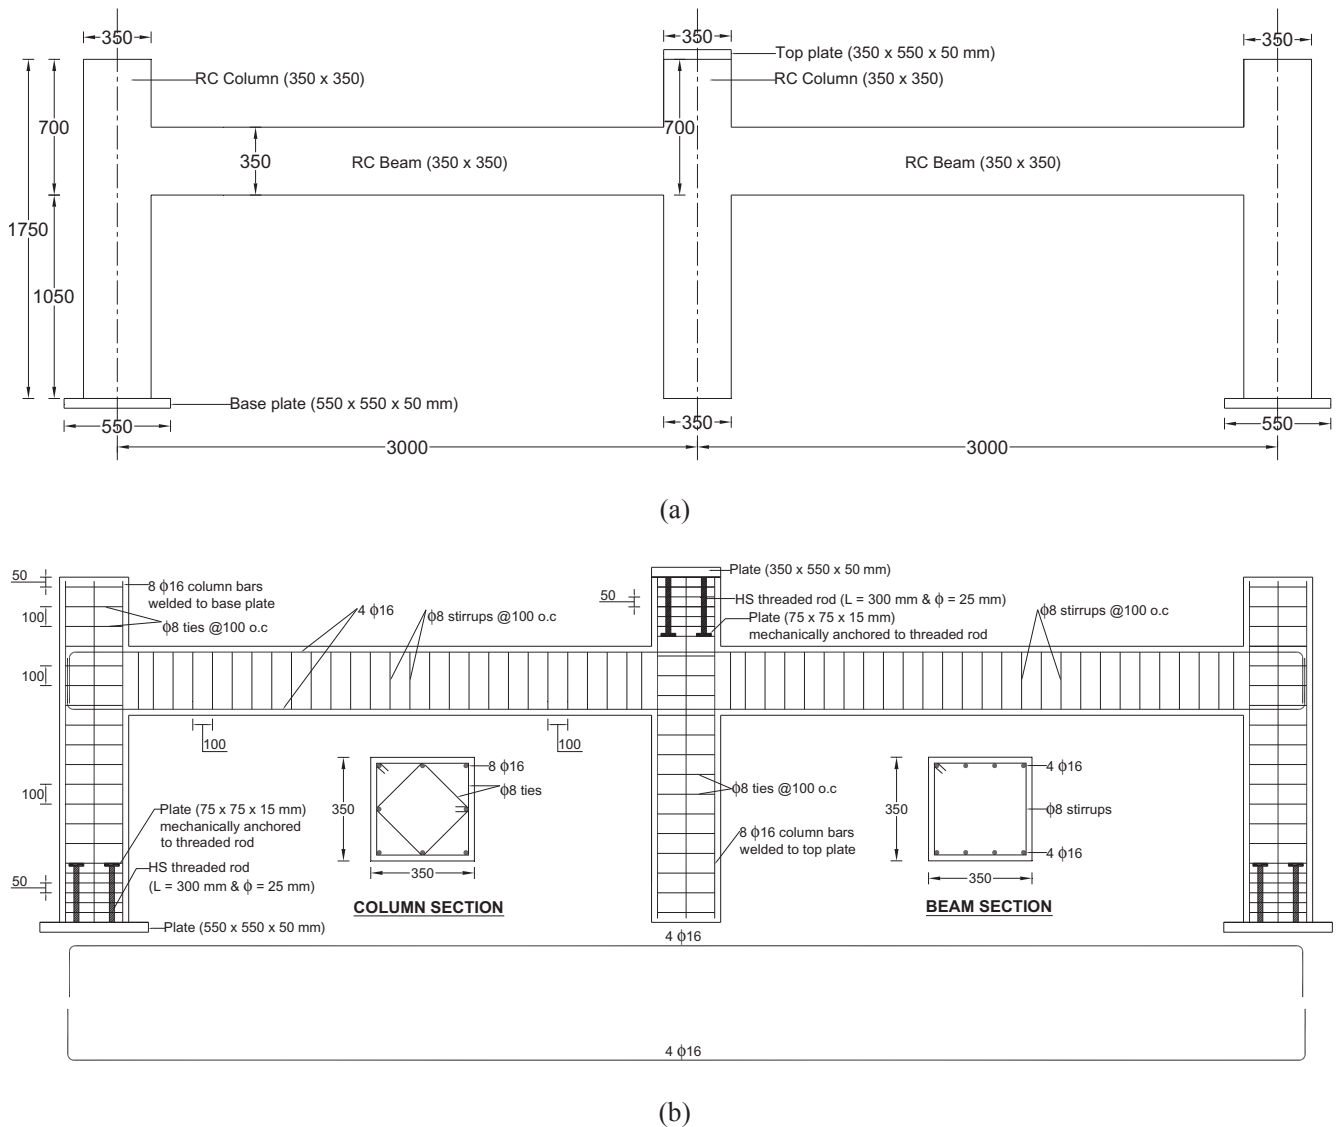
Details of monolithic specimen MC-SMF (Note: All dimensions are in mm): (a) Test specimen; (b) Reinforcement details.
